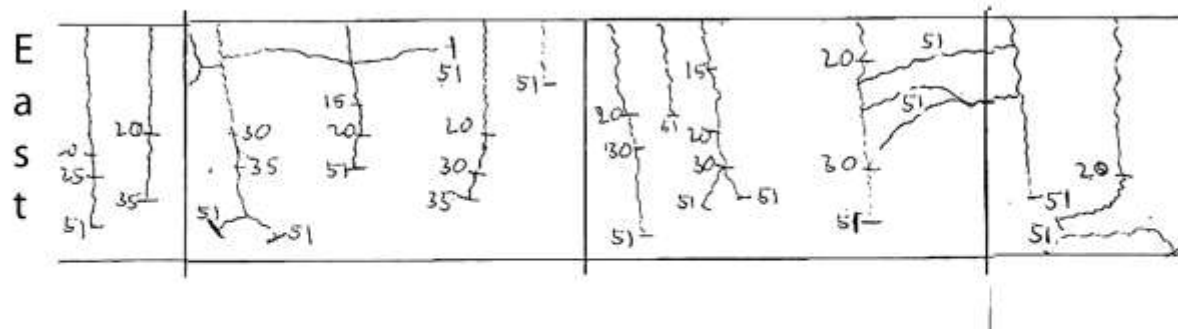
Reinforcing steel drawing for beams with 120 in. splice length – with crack
